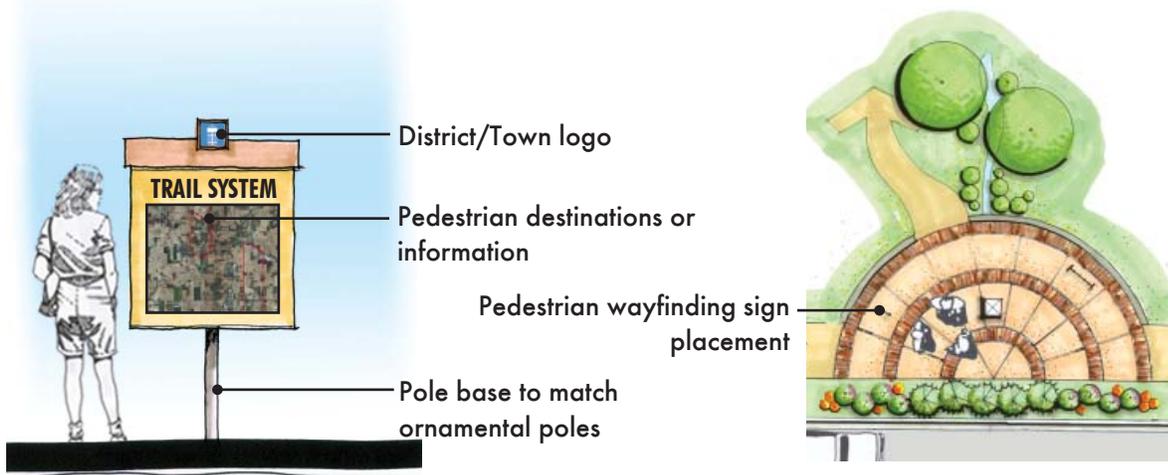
Elevation and typical plan illustrating pedestrian wayfinding signage and typical placement.
